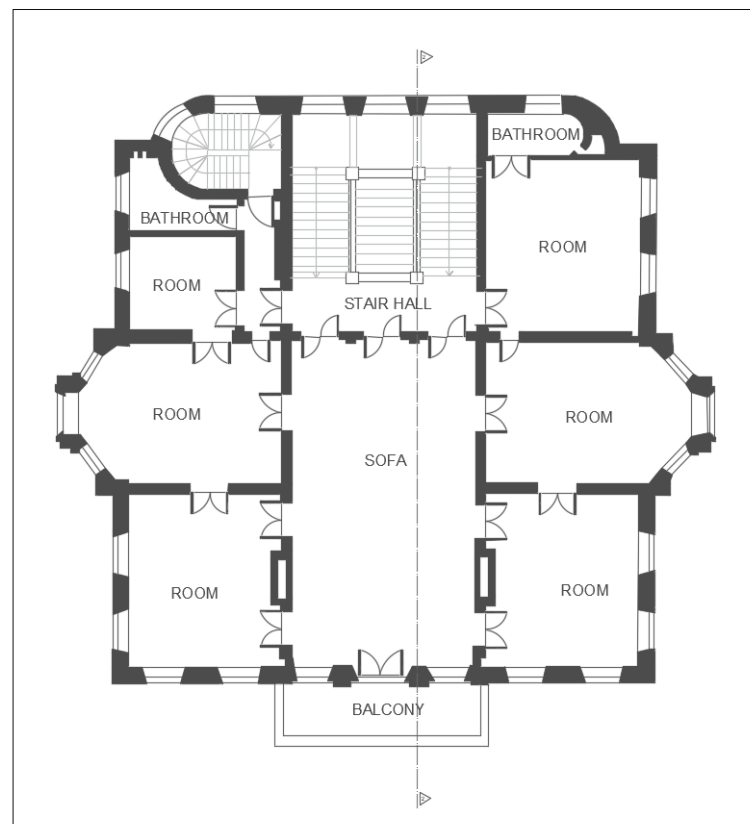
First floor plan of the kiosk (Source : Altınkaynak 2006)
